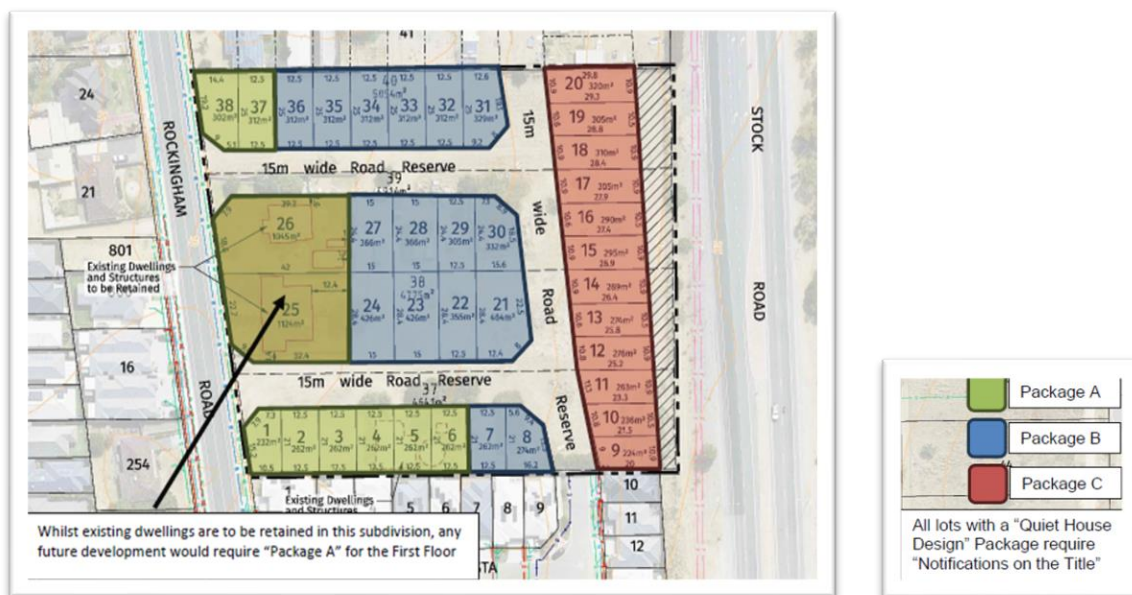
First Floor Extent of required Quiet House Design packages (without a noise wall)
